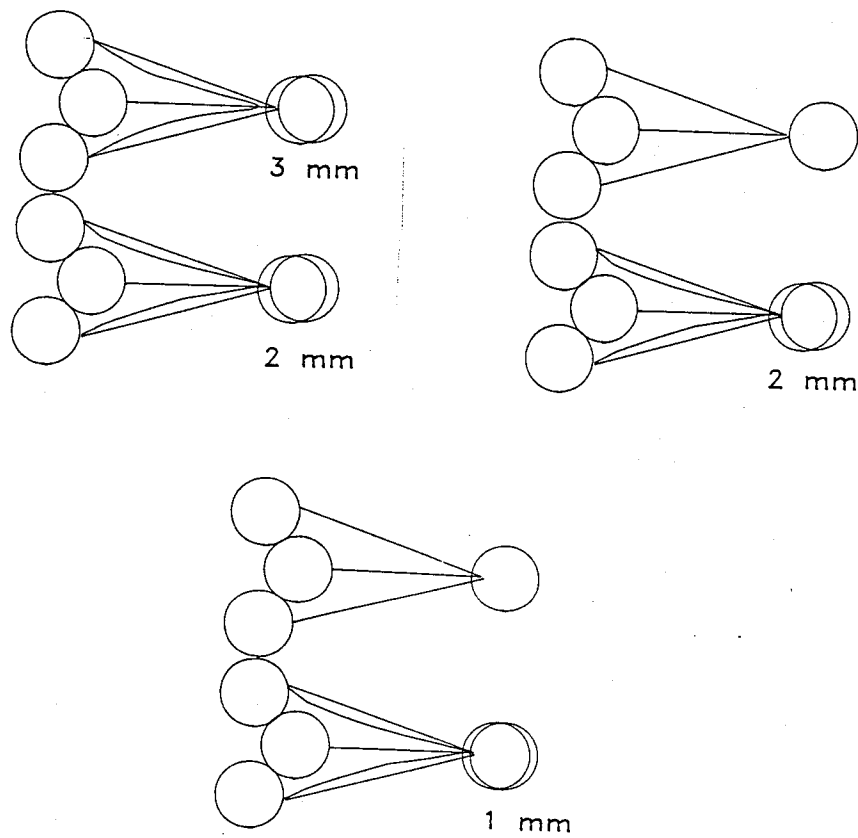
Outward Movement of Anchor Tyres - Lateretic Fill
